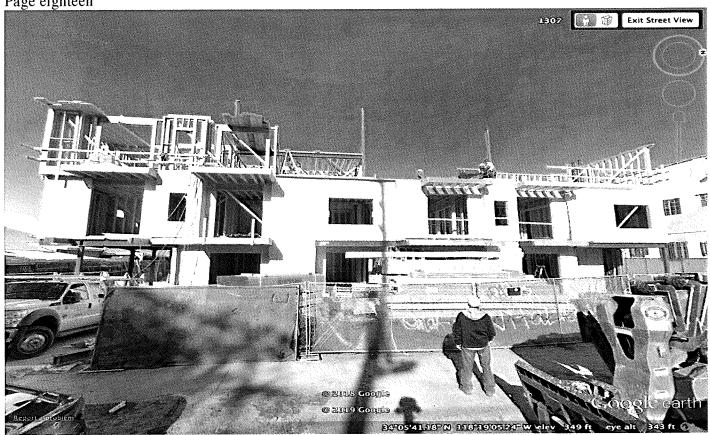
unit apartment building under construction at 1310 N. Tamarind Ave.
